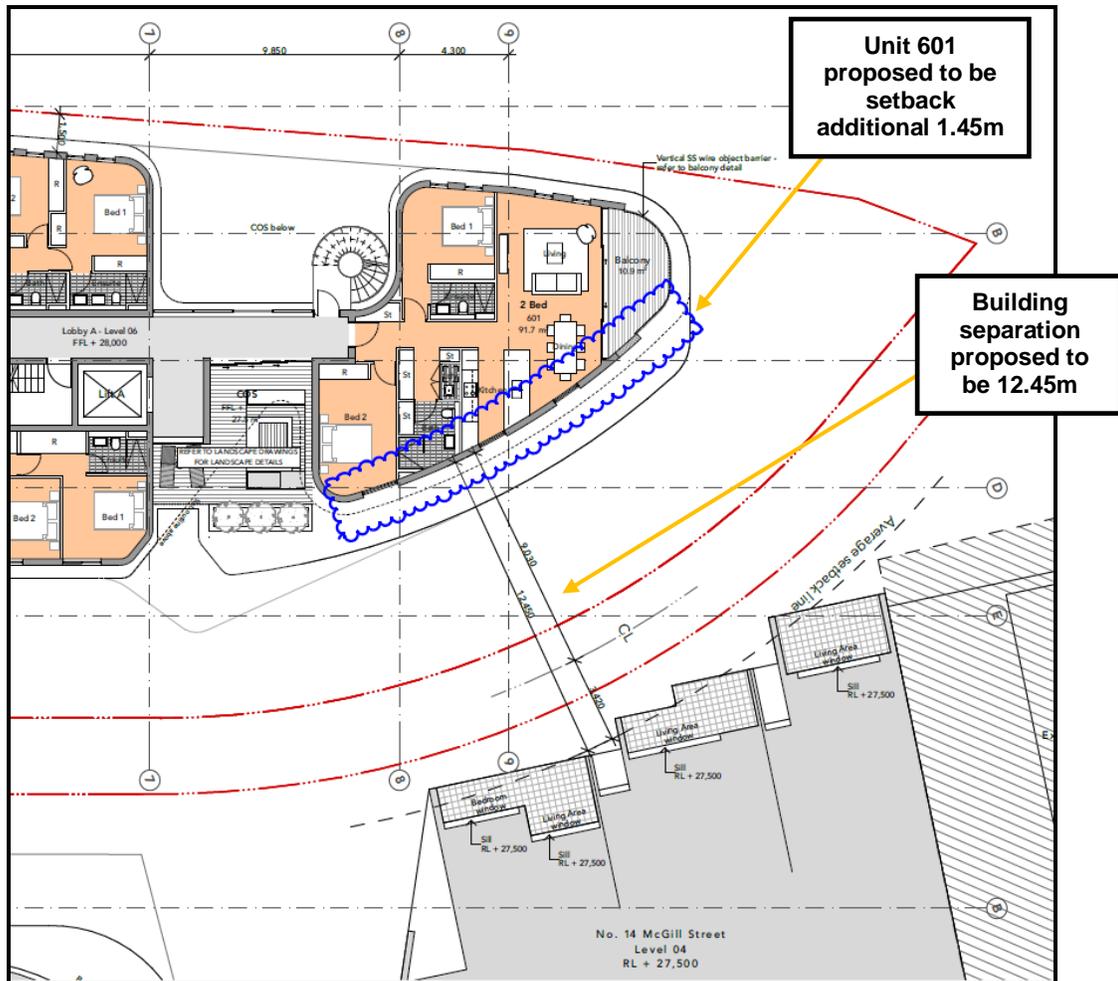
Excerpt Level 6 Floor Plan illustrating refuge increased building separation to No. 14 McGill Street.
